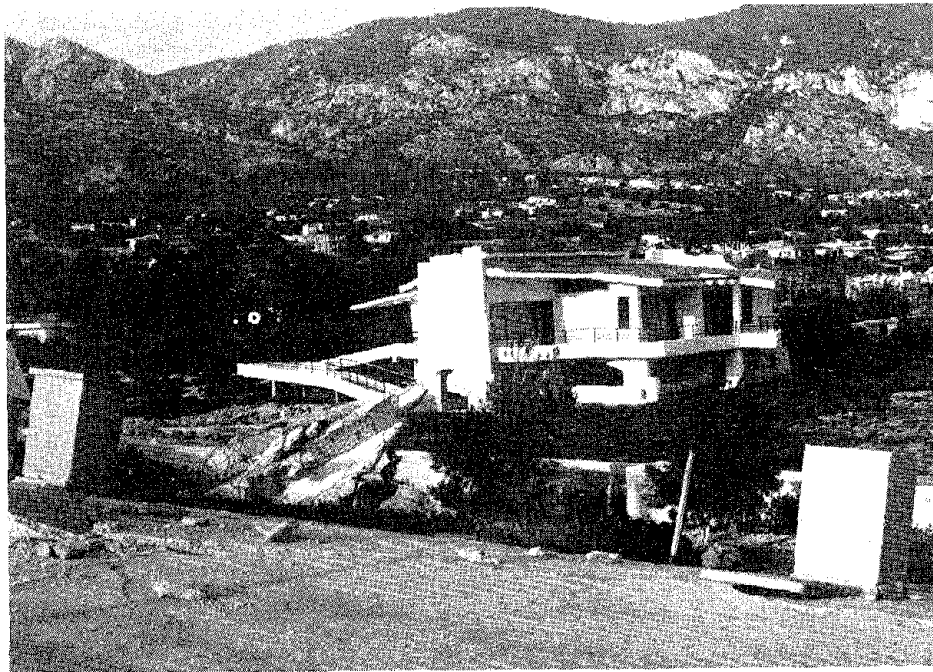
Column stubs on roof of Kineta hotel to accommodate future expansion. Home in background was undamaged.
